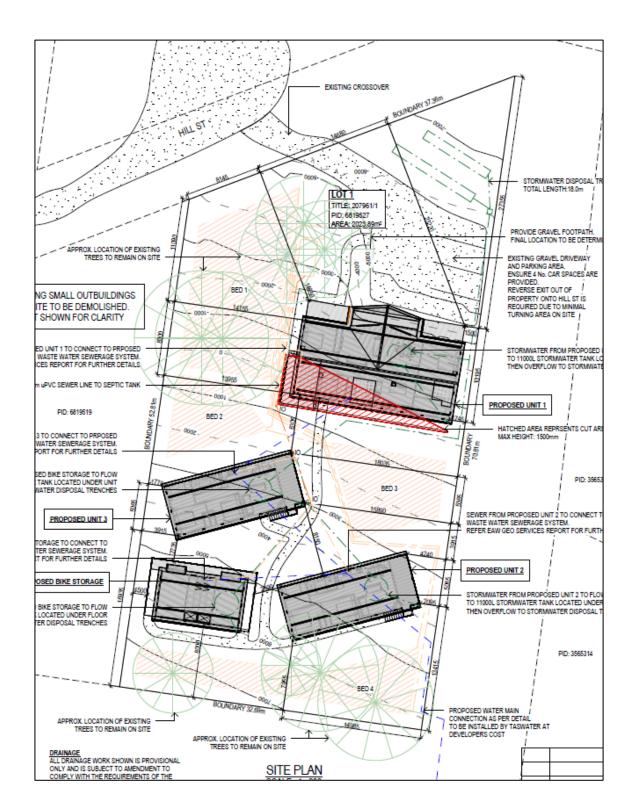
Site Plan Showing all large trees to remain on site (source: TasBuilt Homes 2019)
